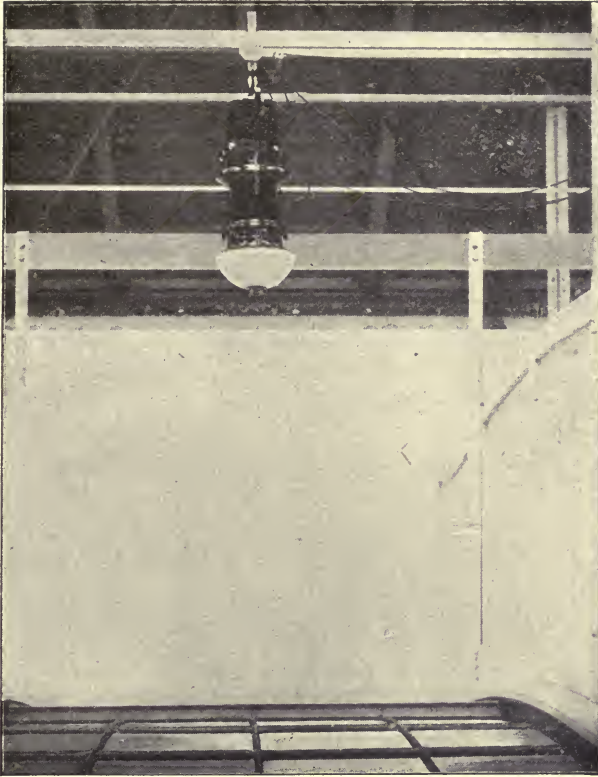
Illumination by Means of Arc Lamps above a Glass Ceiling.
